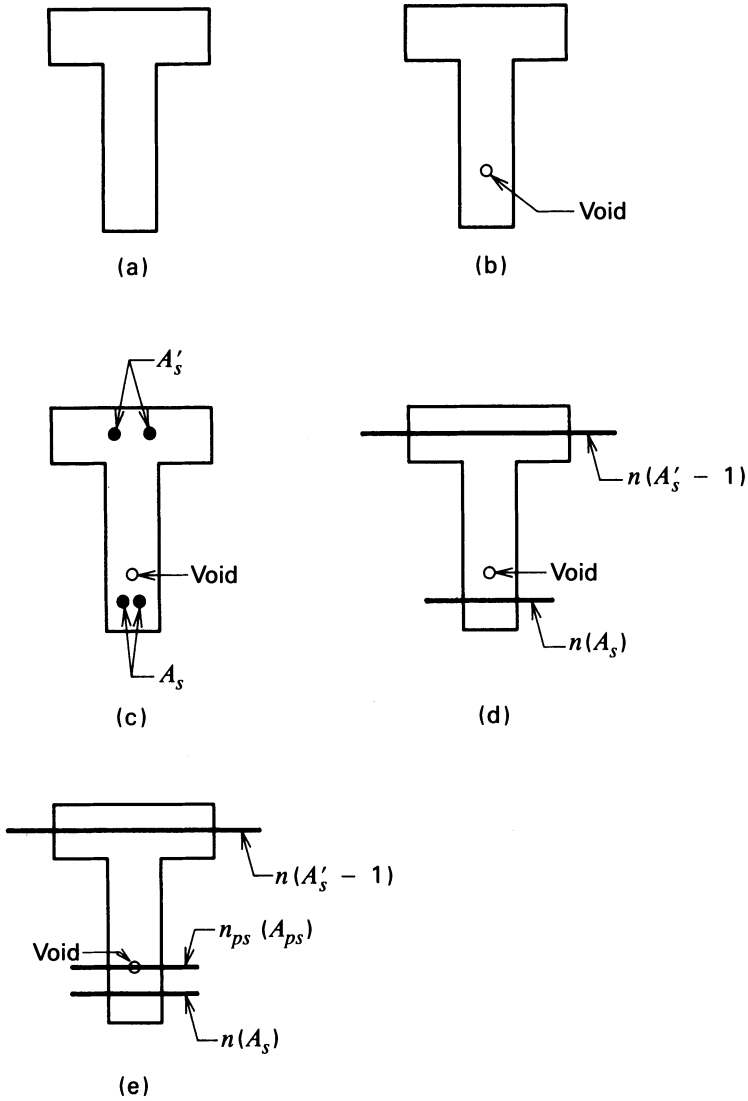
Cross sections of a beam illustrating: (a) gross concrete section; (b) net concrete section having void for either pretensioned reinforcement or duct, or preformed hole for post-tensioned reinforcement; (c) gross section (containing nonprestressed tension and compression reinforcement as well as a void for prestressed reinforcement); (d) transformed net section (containing transformed nonprestressed reinforcement and void for post-tensioning reinforcement, duct, or pretensioned reinforcement); (e) gross transformed section (containing prestressed and nonprestressed reinforcement).
